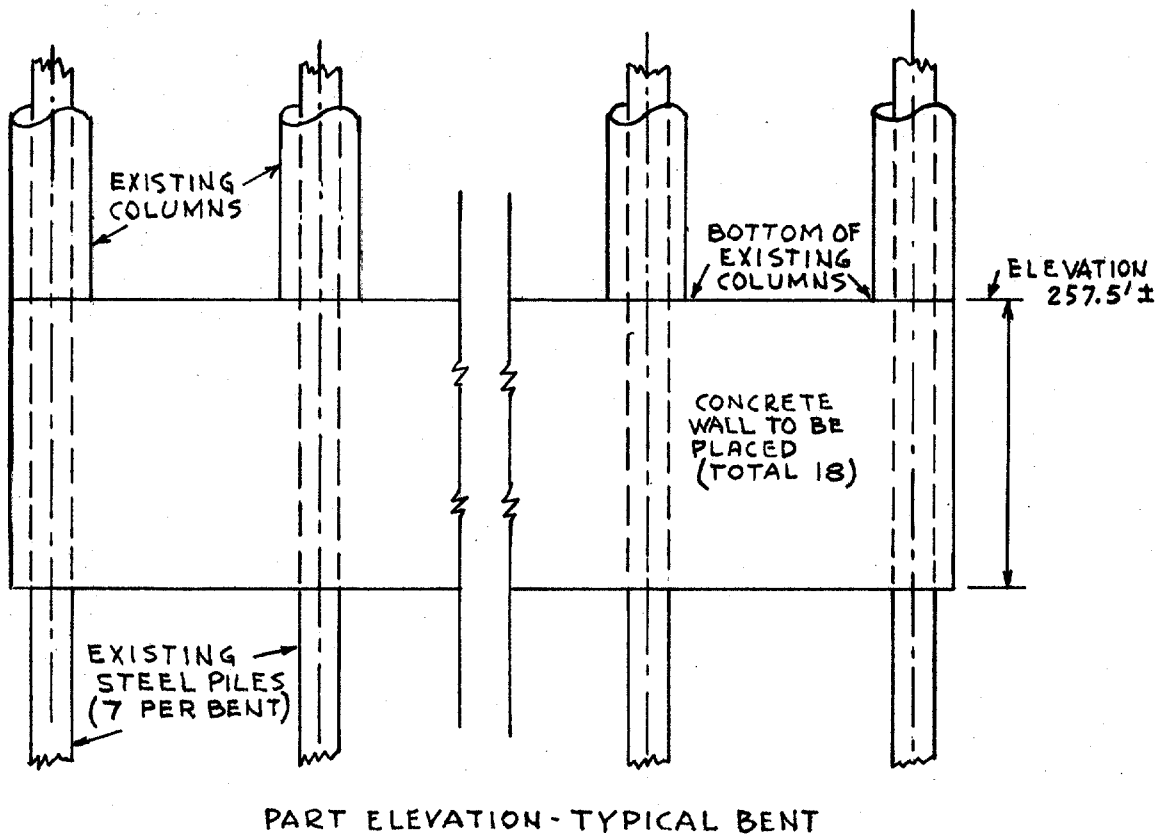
Repairs made in 1967 to exposed parts of steel H-piles.
